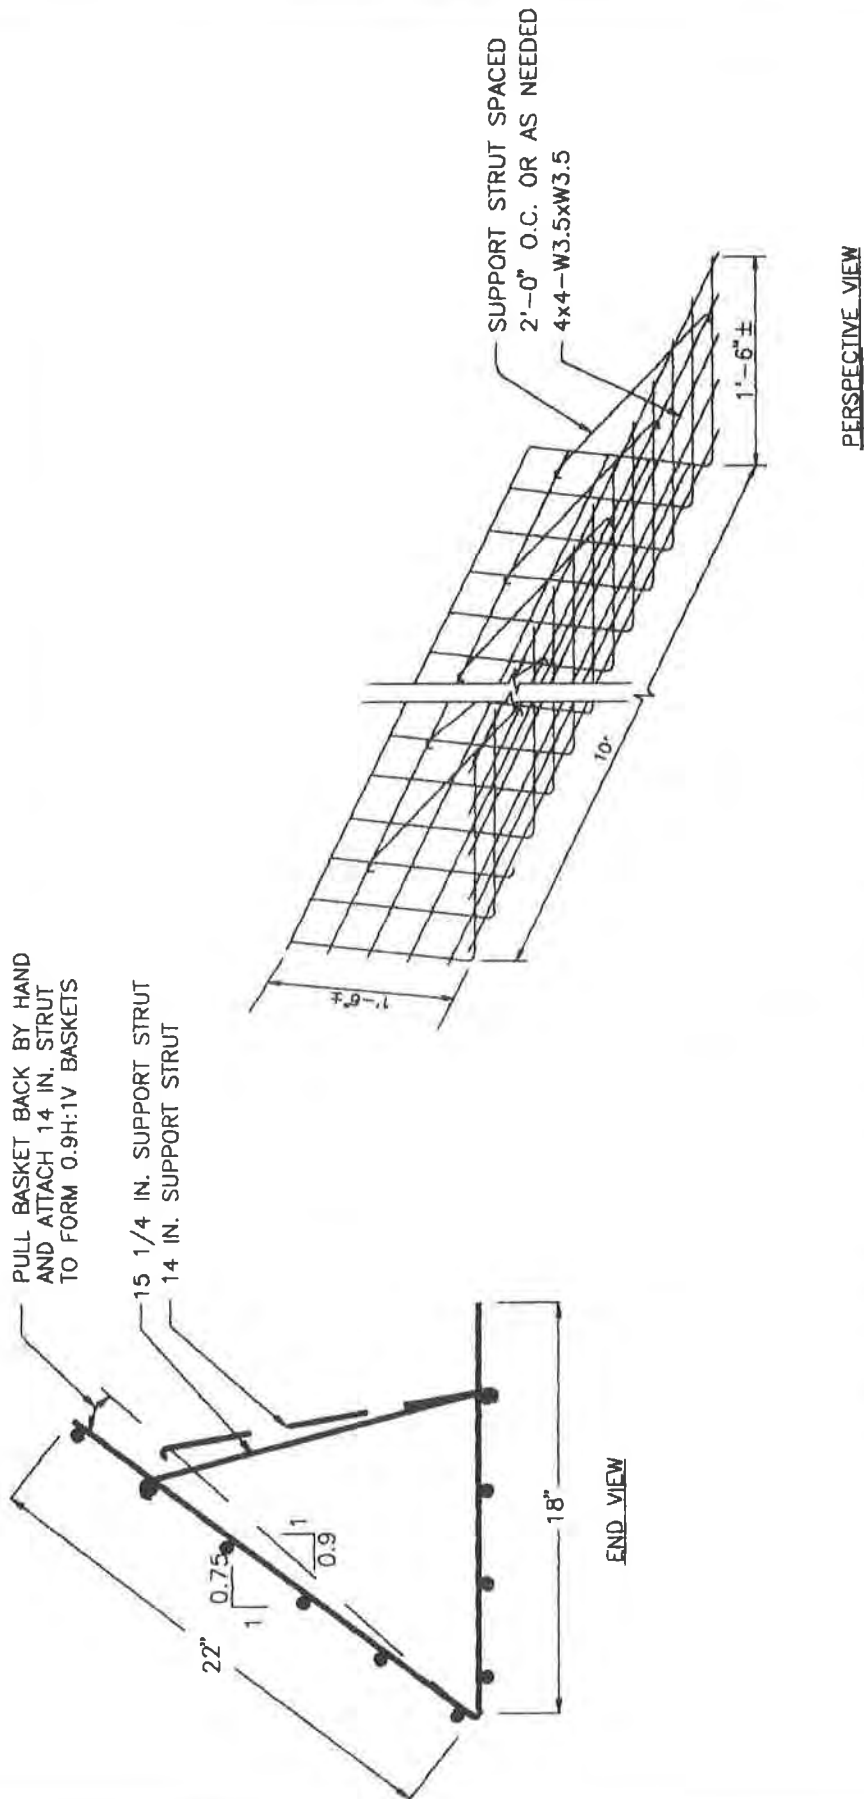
WELDED WIRE FORM DETAIL
